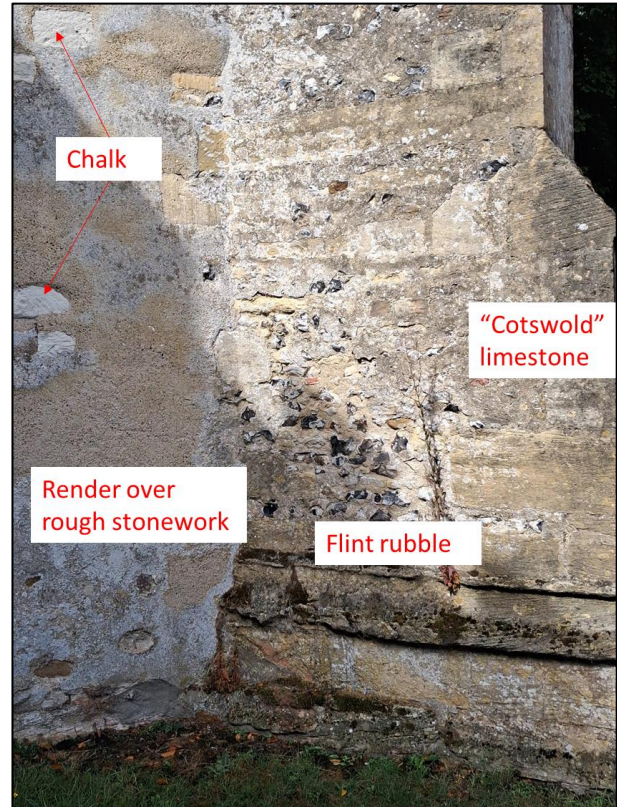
Buttress of St Michaels & All Angels Church, showing mix of building stone used in construction.
